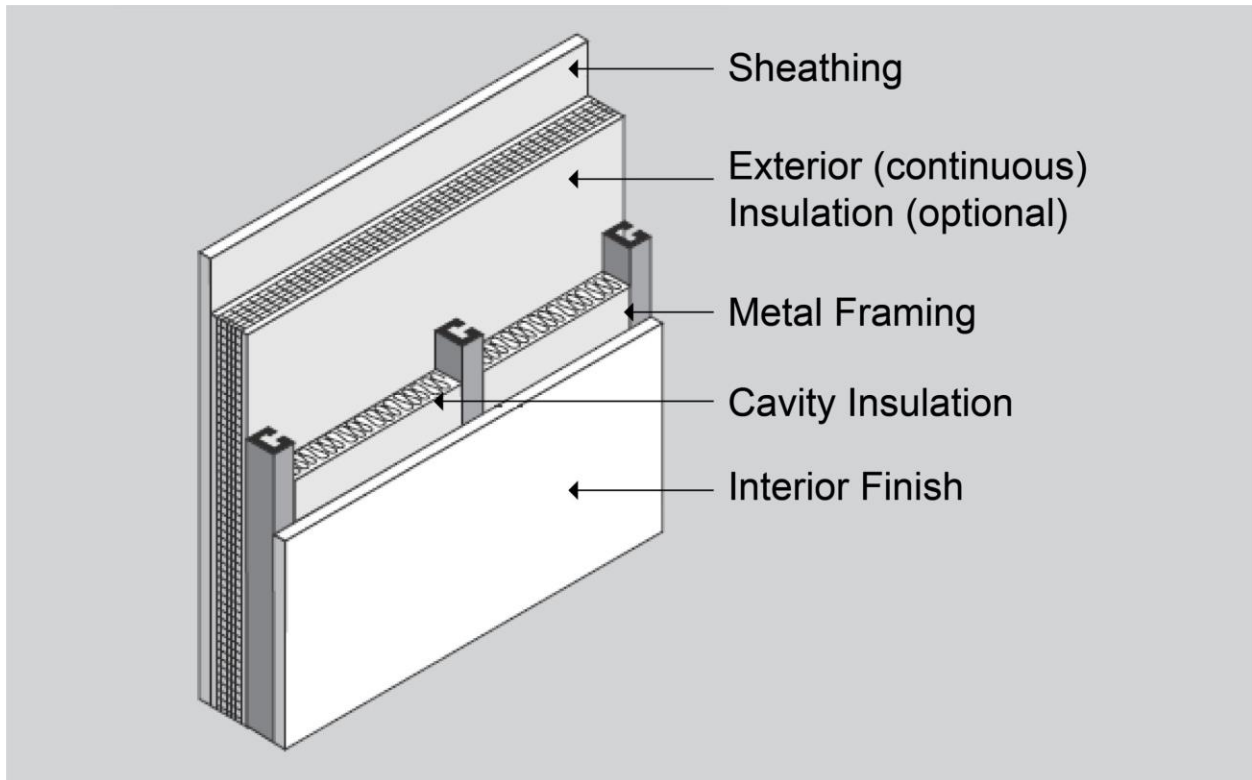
A detail explaining the construction and installation process of a high-performance building envelope which can be used during the construction of the site.
